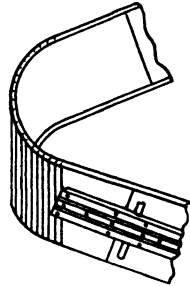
Completed Wreath-Piece Removed from Cylinder
